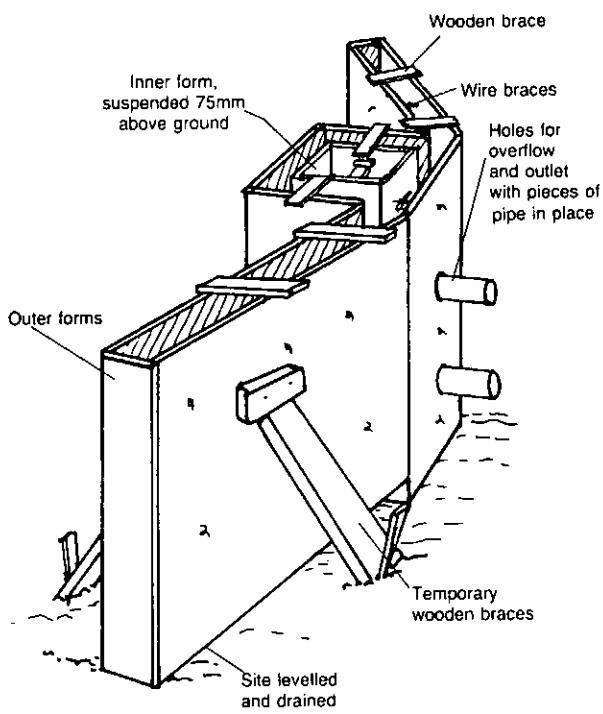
Forms for Anti-Seepage Wall and Collection Box
